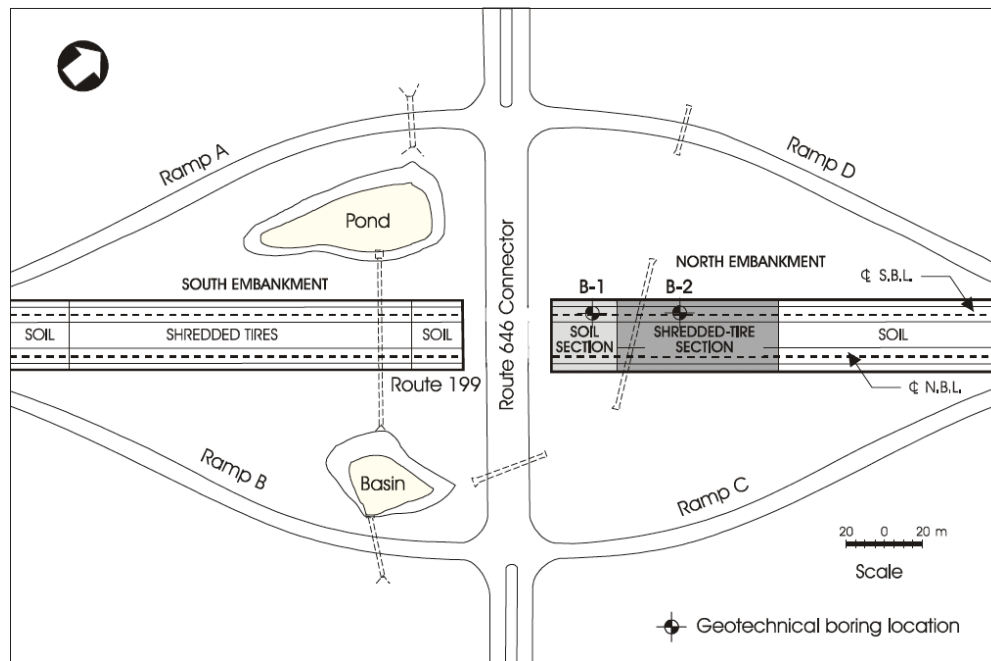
Site Location at the Intersection of Route 199 and the Route 646 Connector.
